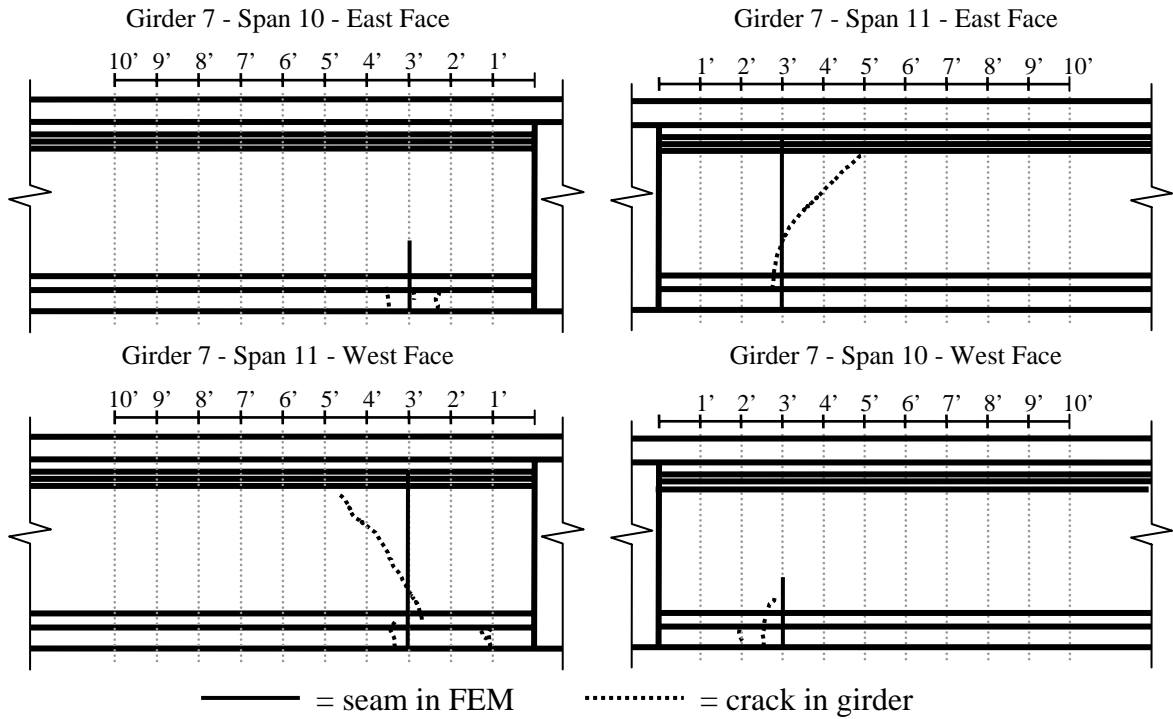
Girder Line 7 Cracks with Seams Superimposed (Fason and Barnes 2004)
